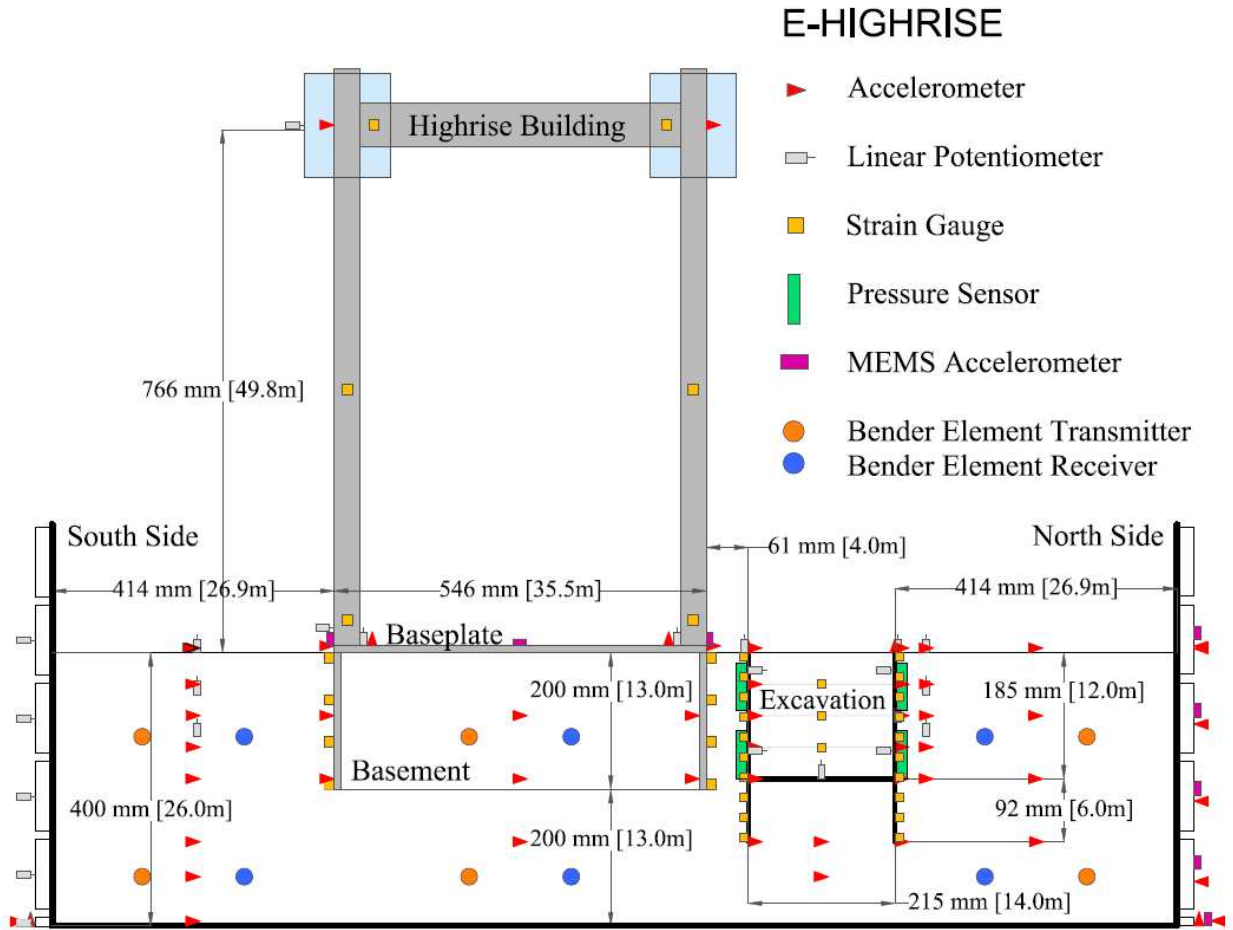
E-Highrise instrumentation layout shown in elevation view (dimensions shown in model scale).
